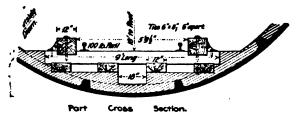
St. Clair Tunnel; Grand Trunk Ry.
